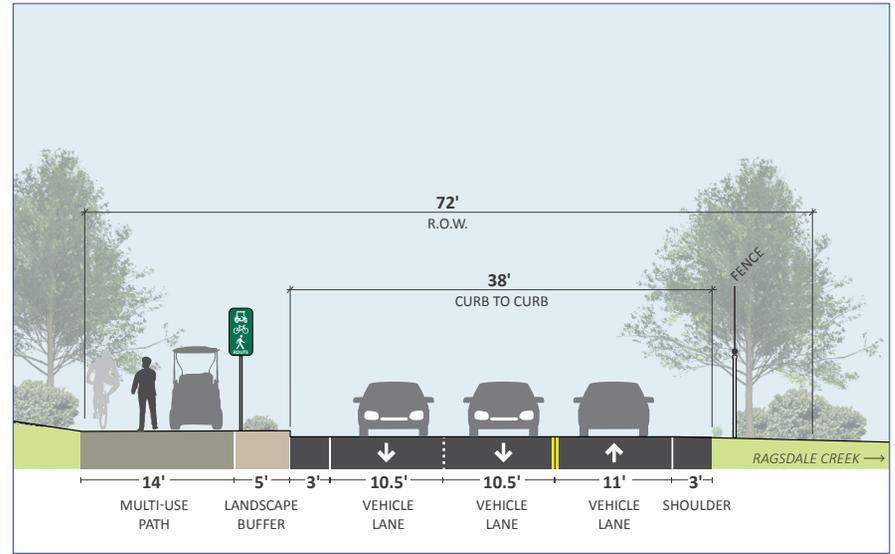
Proposed Street Section of Combie Road with New Multi-use Path (looking east)
